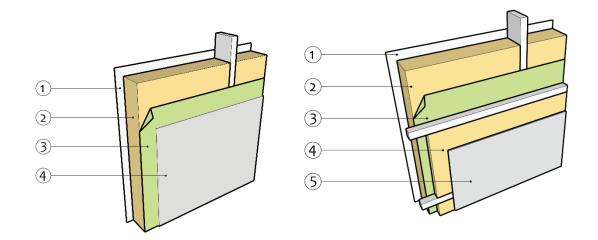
Conventional 90/140mm timber framed wall and timber framed wall with intello then service cavity.
